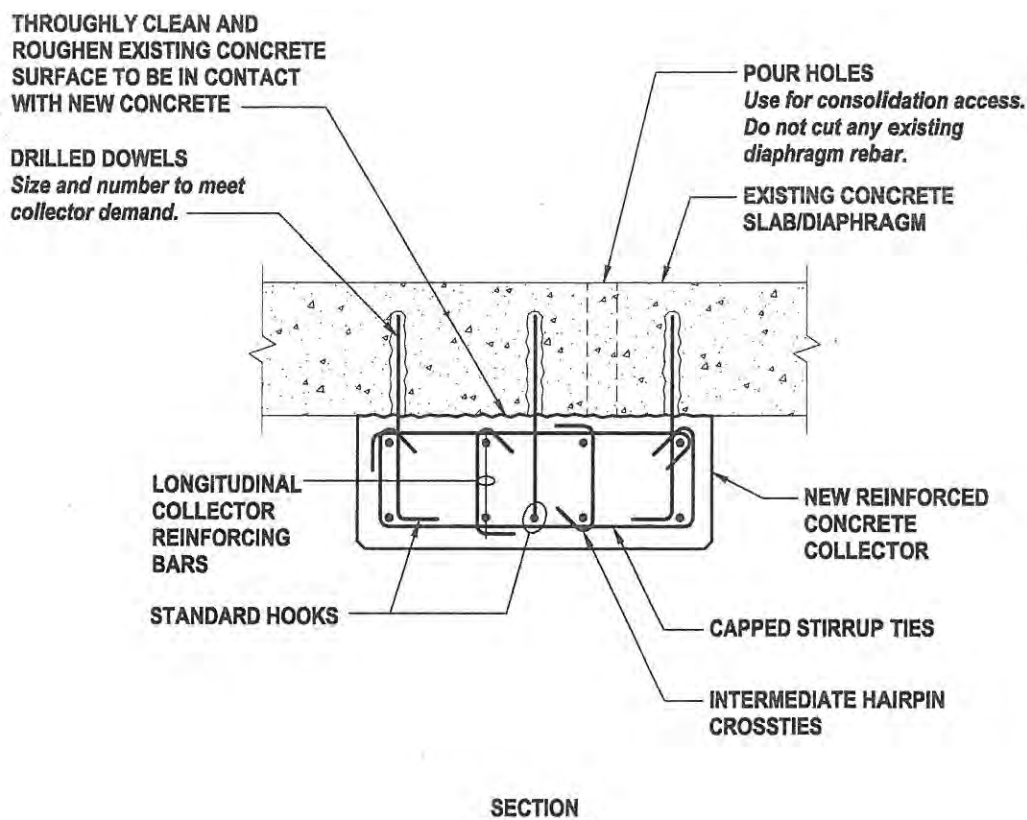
Concrete Collector at Concrete Slab
